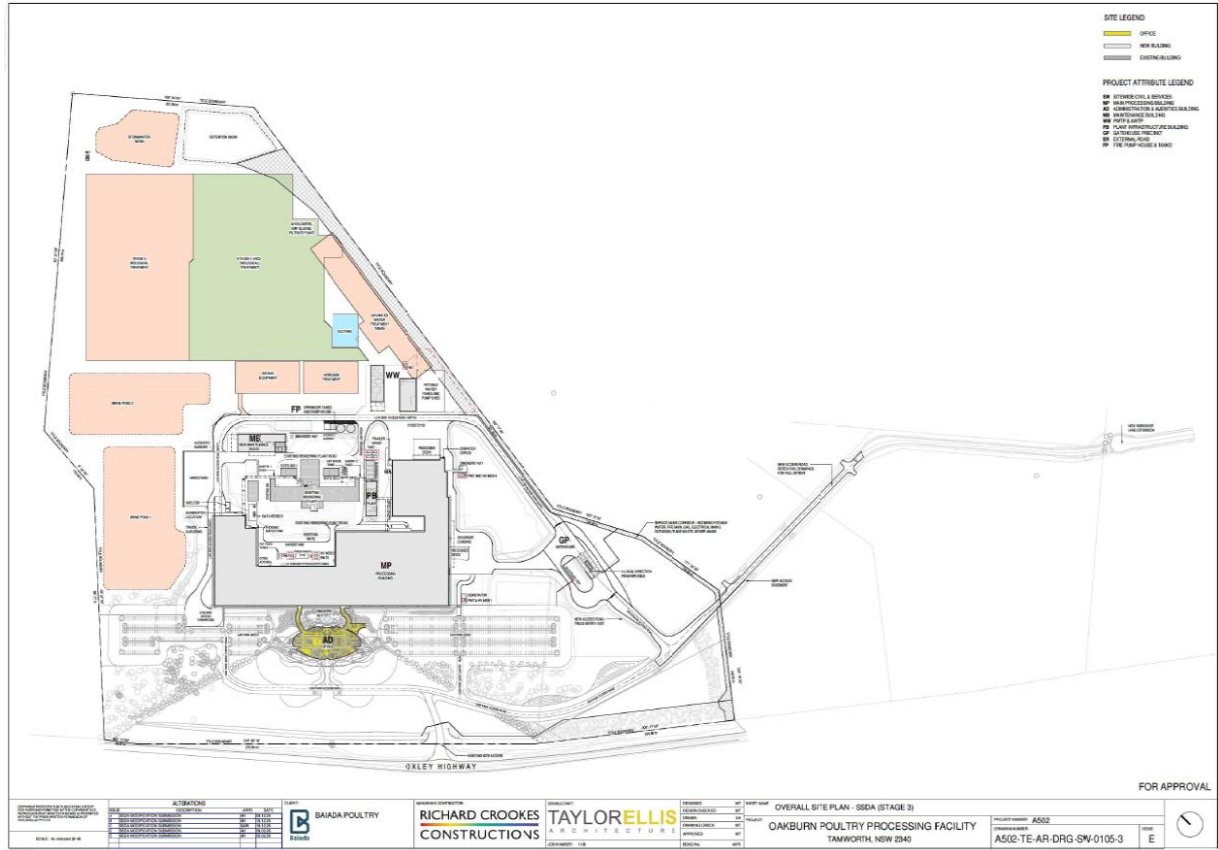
Proposed WWTP Layout – Stage 3 (Concept Design)
